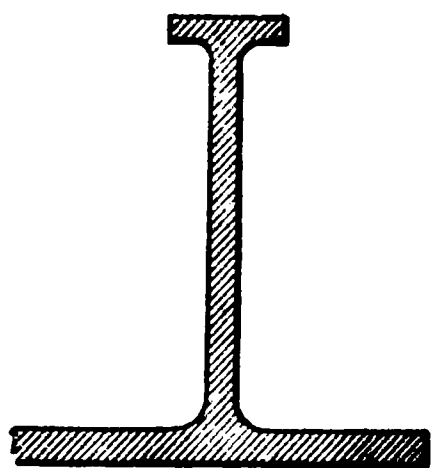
Cross-section of Cast-iron Lintel of Ideal Form
